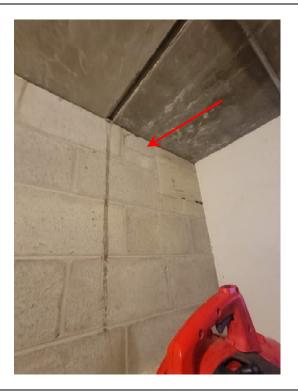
Damaged CMU Wall below Precast Concrete Planks
